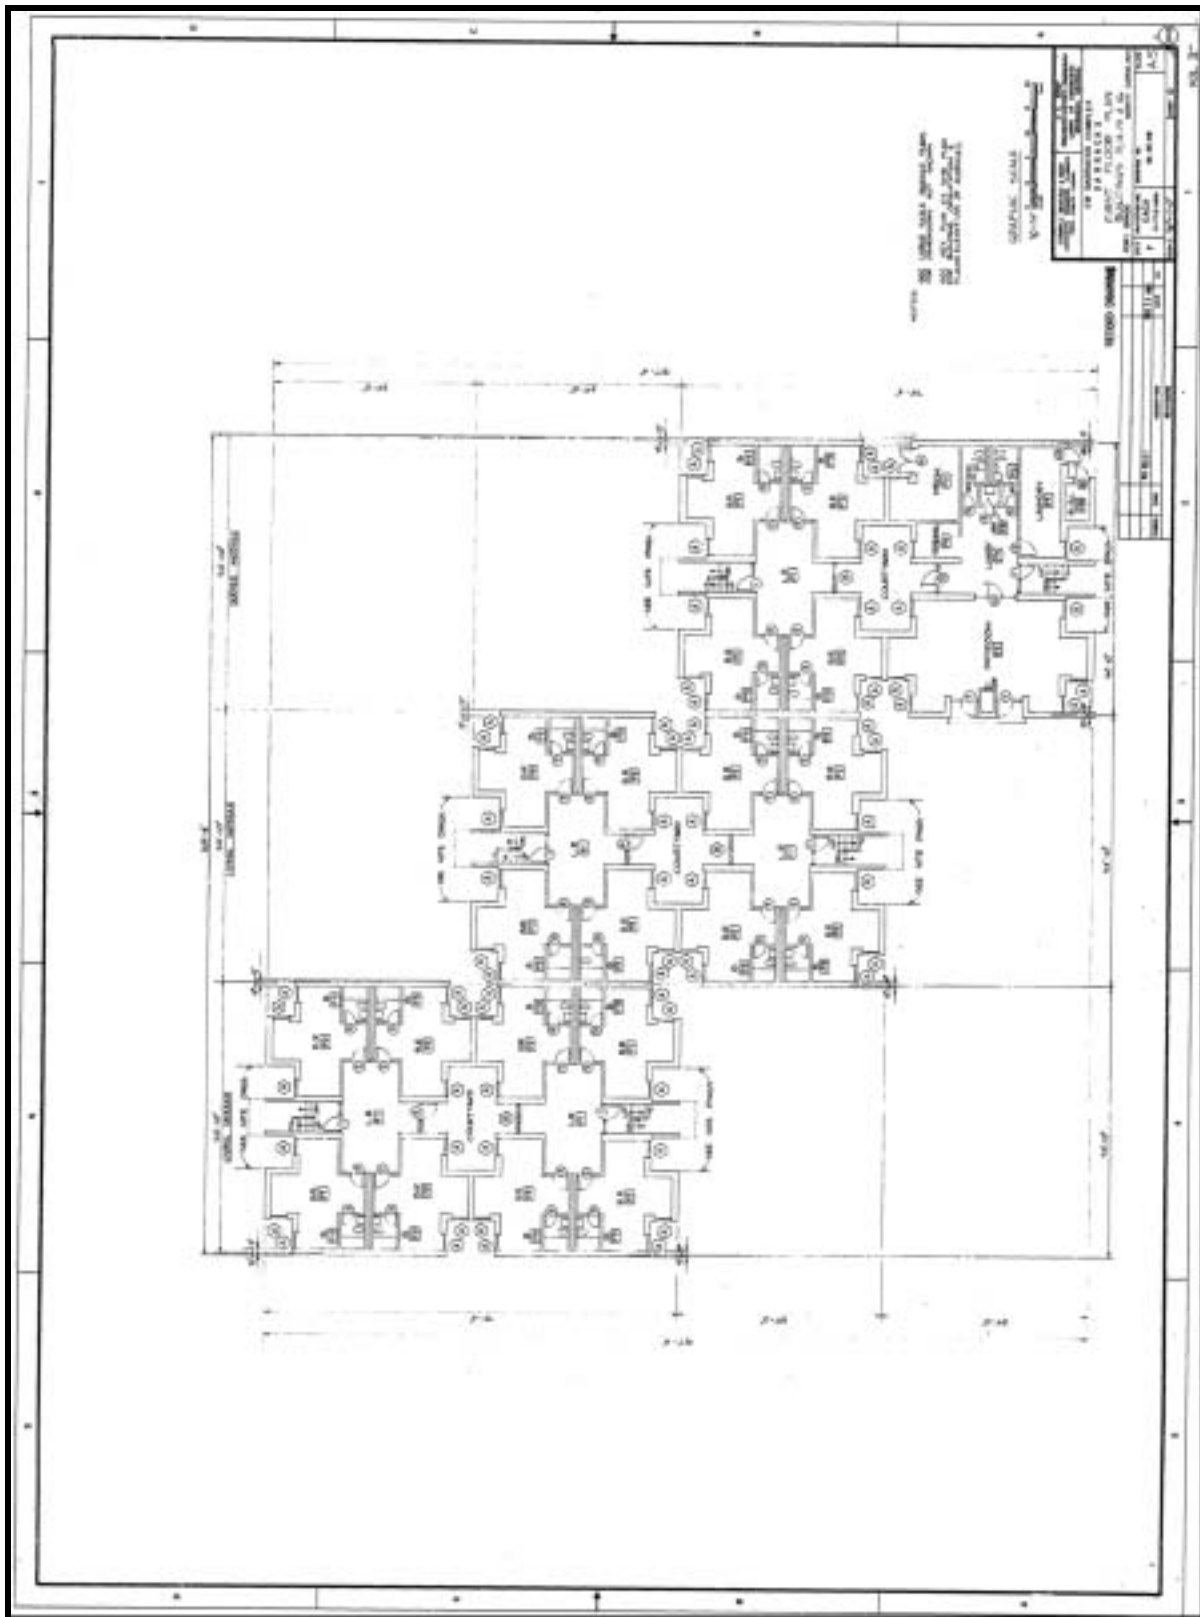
Three-building LBC&W barracks, first floor plan, Ft. Bragg (ca. 1972, revised 1981) (Engineering, Ft. Bragg).
